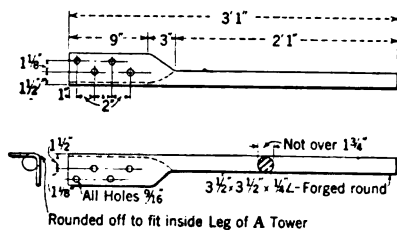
ROCK FOOTING FOR "A" TOWERS
